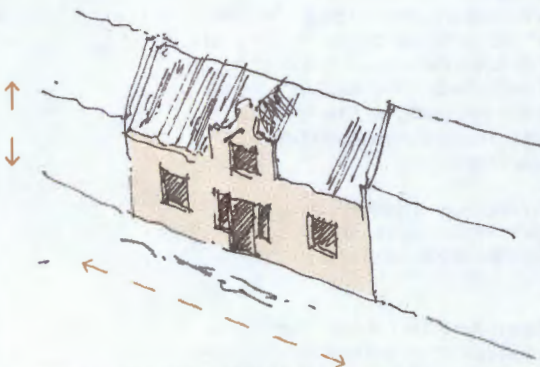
Typical Cape Dutch town house typology (sketch by author, 2010)
